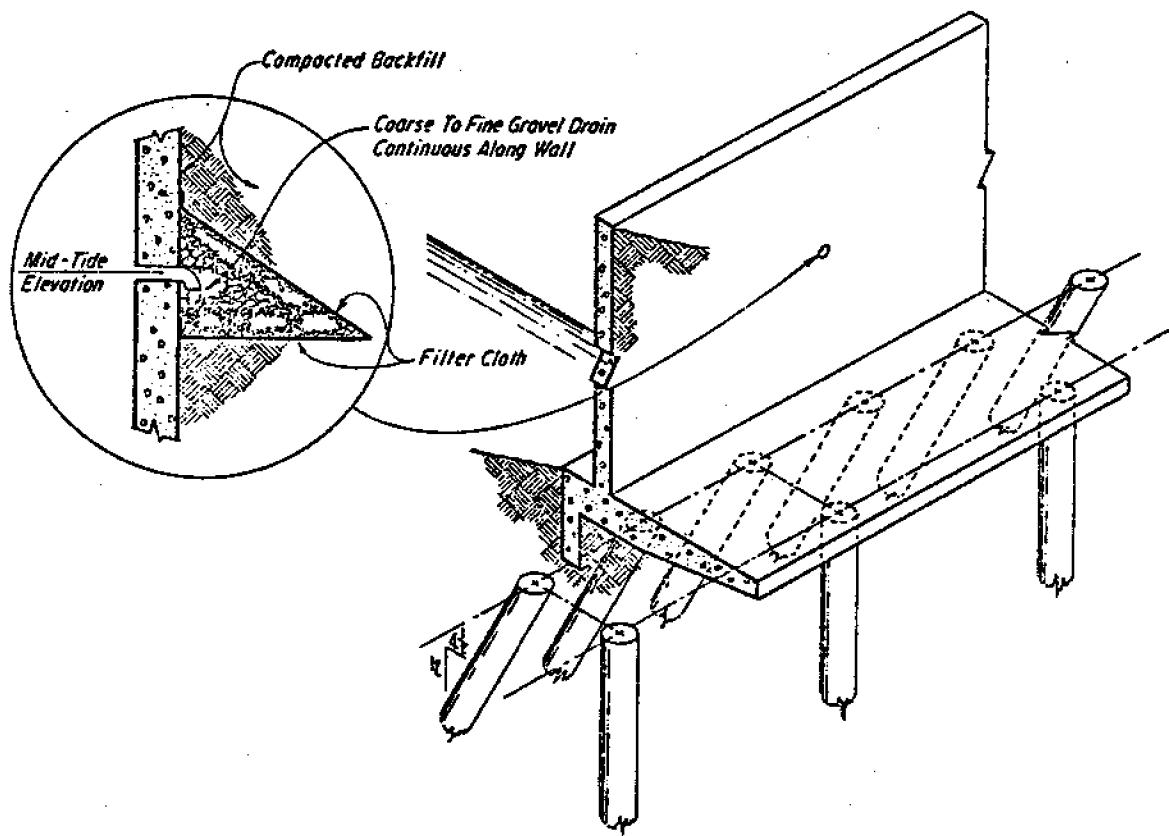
Typical Pile Supported "L" Wall for Weak Soils.
